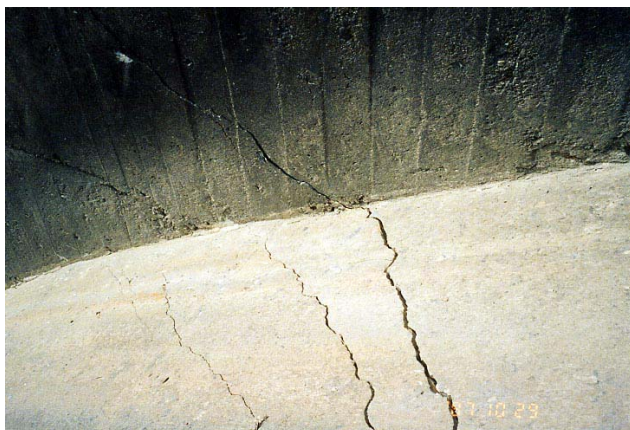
Cracks extending diagonally up through Pier #10
